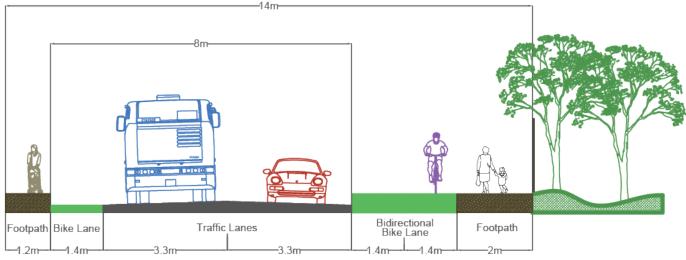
Proposed reconfiguration of Bennelong Parkway, looking north
